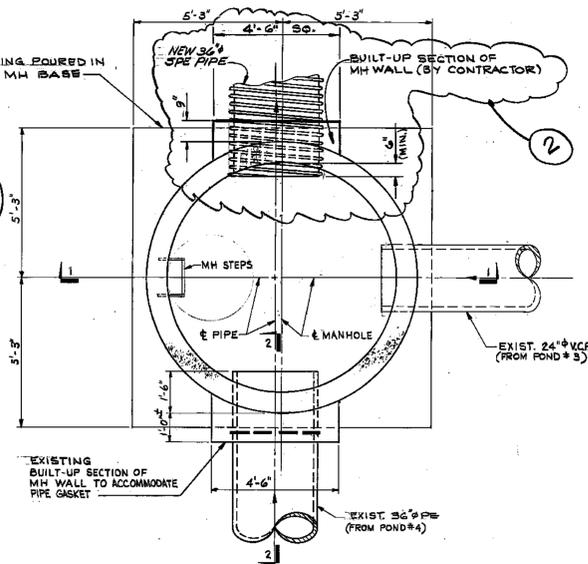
(New Filter Pond 4 Plan, Sections & Details)
